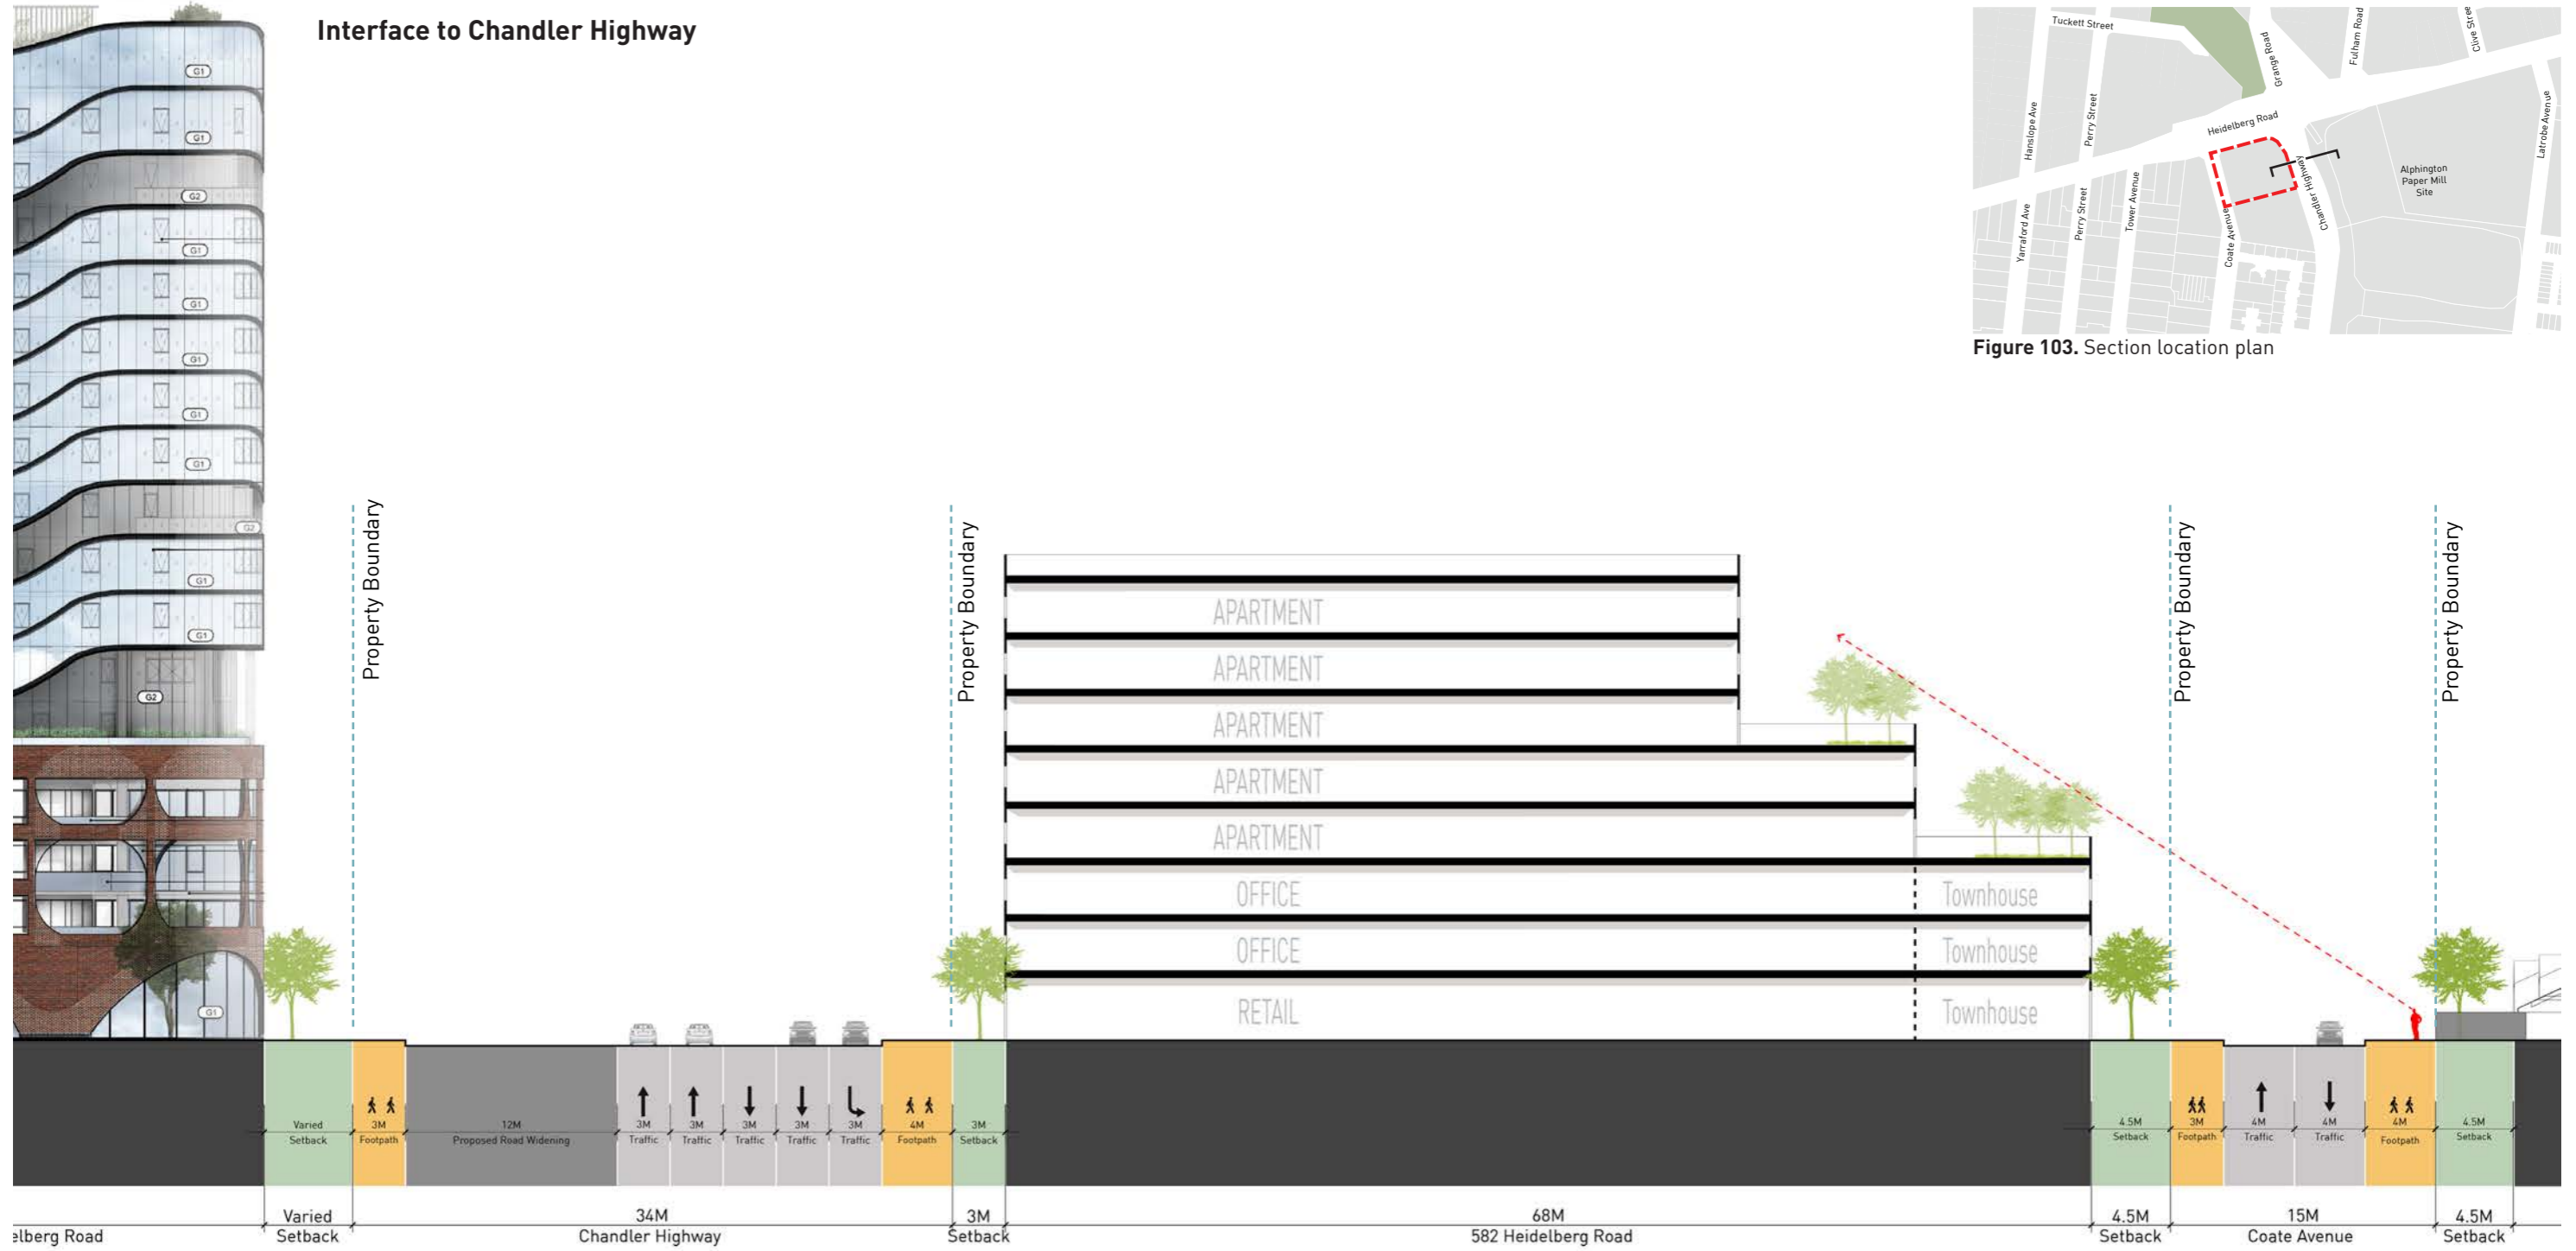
Proposed street section - full street section with indicative floor levels illustrated within this envelope for reference only. These are not intended to illustrate acceptable building designs.
